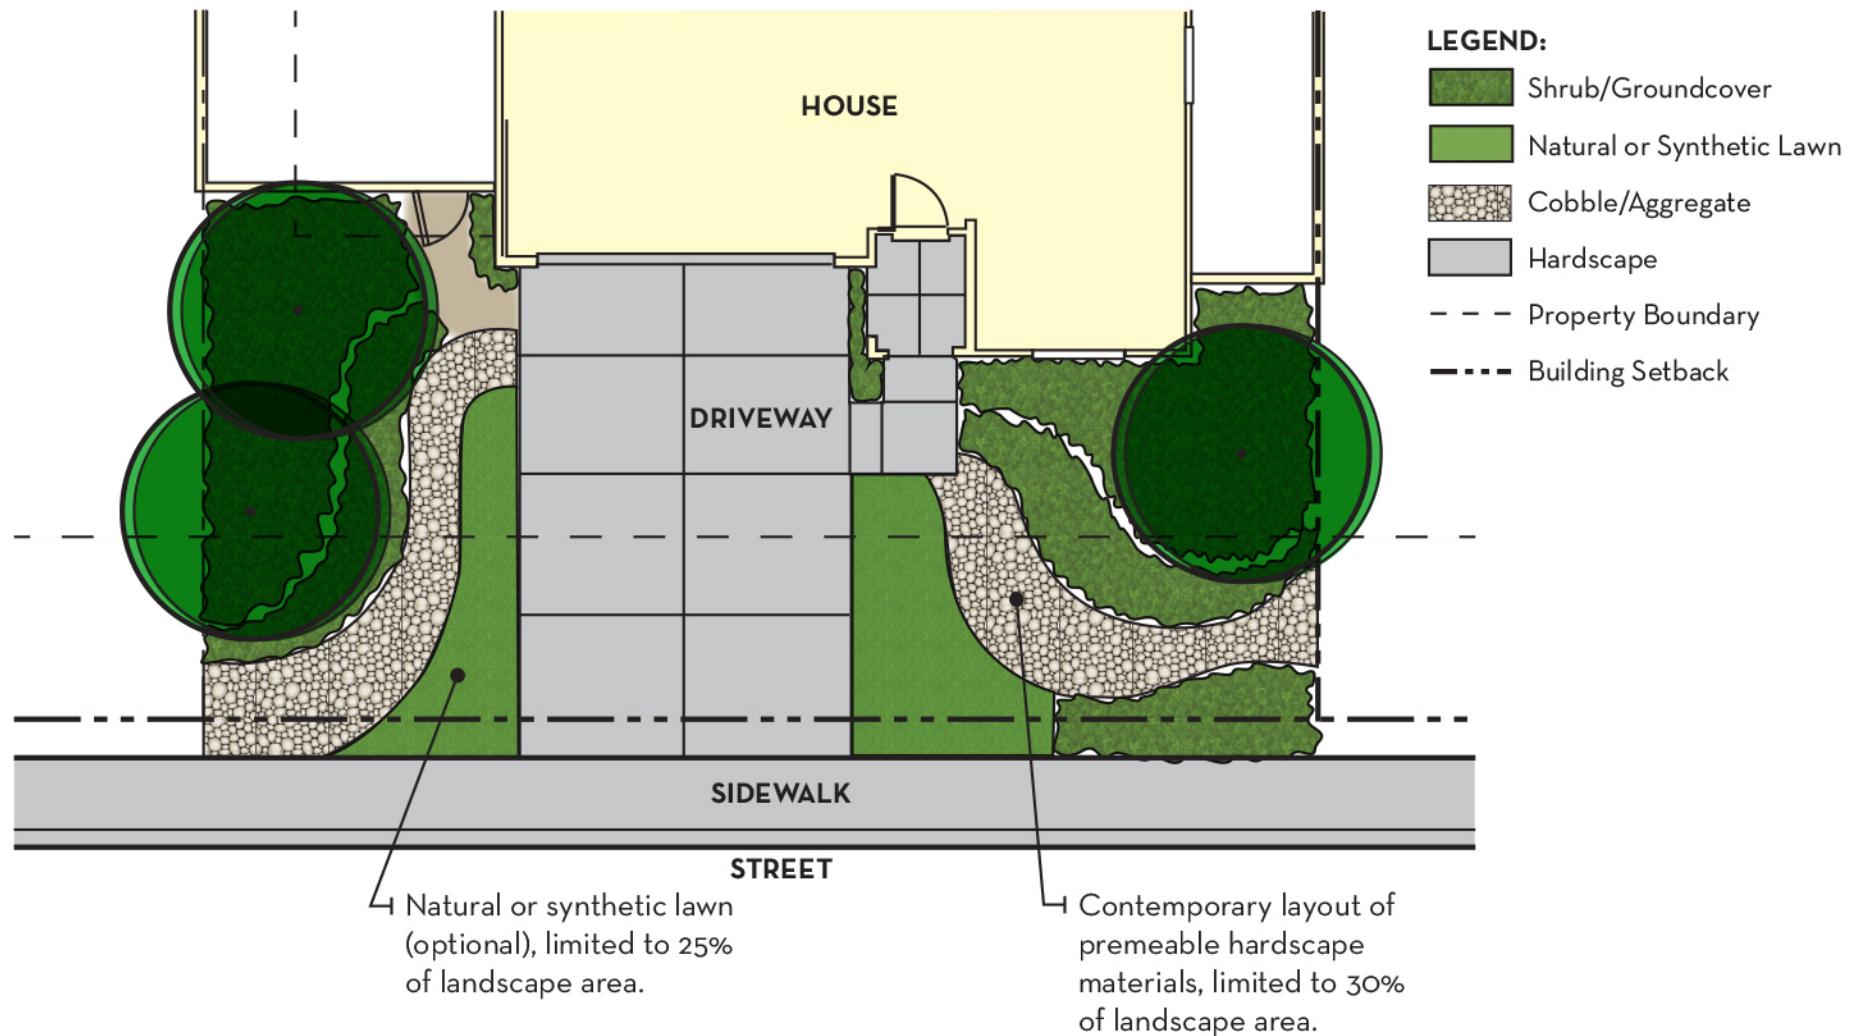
Dry Stream Bed Conceptual Landscape Plan
